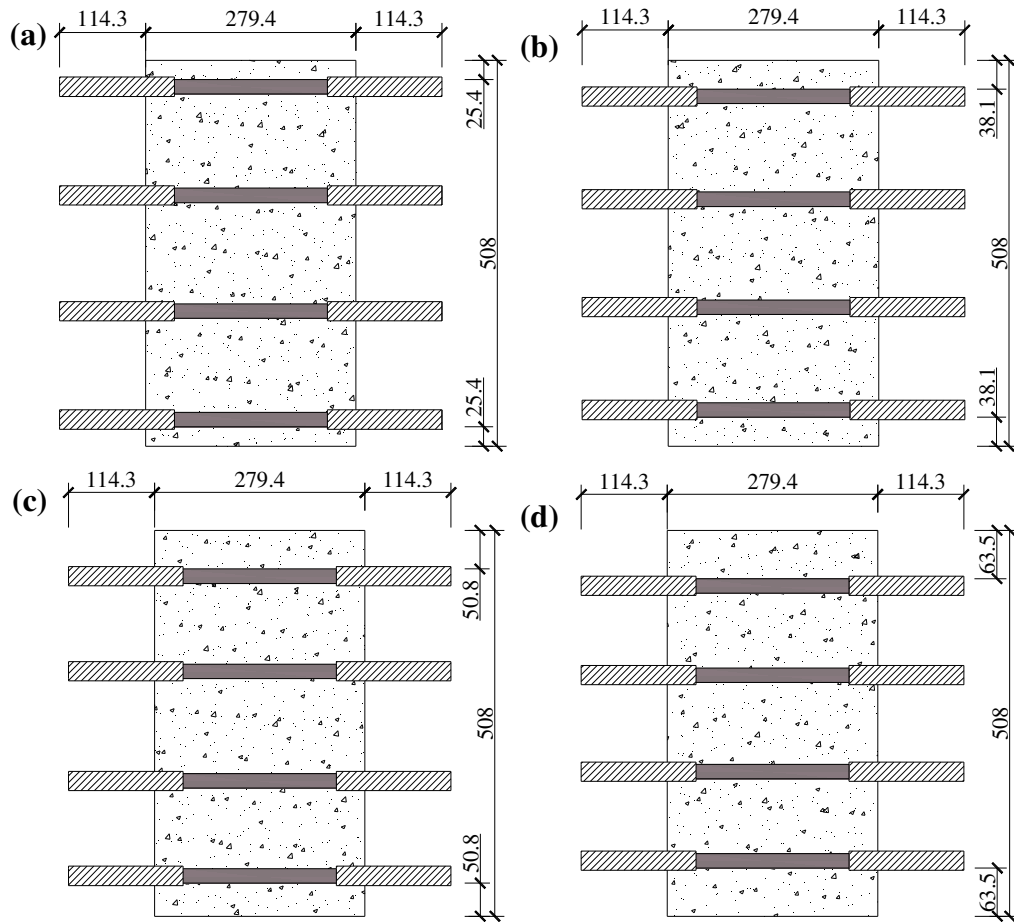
Side views of large concrete blocks with four concrete cover thicknesses: (a) 25.4 mm, (b) 38.1 mm, (c) 50.8 mm, and (d) 63.5mm (unit: mm).
